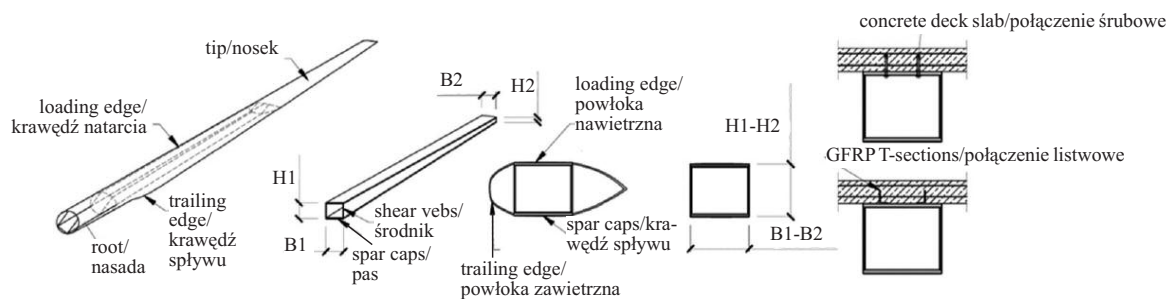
Concept of a hybrid span made of Vestas V-66 girders
